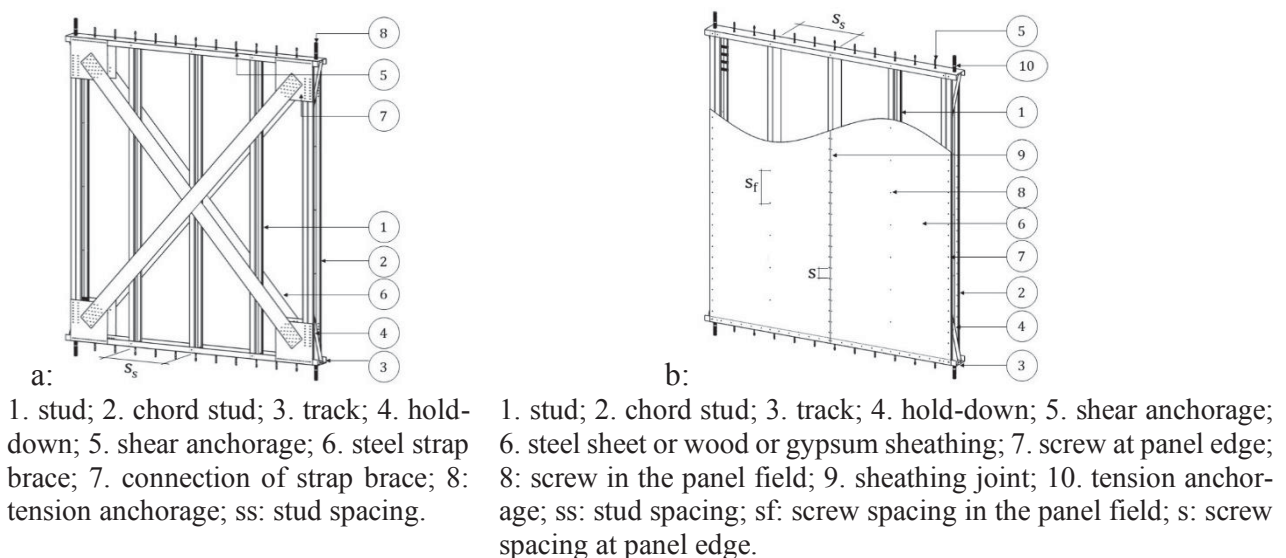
a: CFS strap braced wall; b: CFS Shear walls
